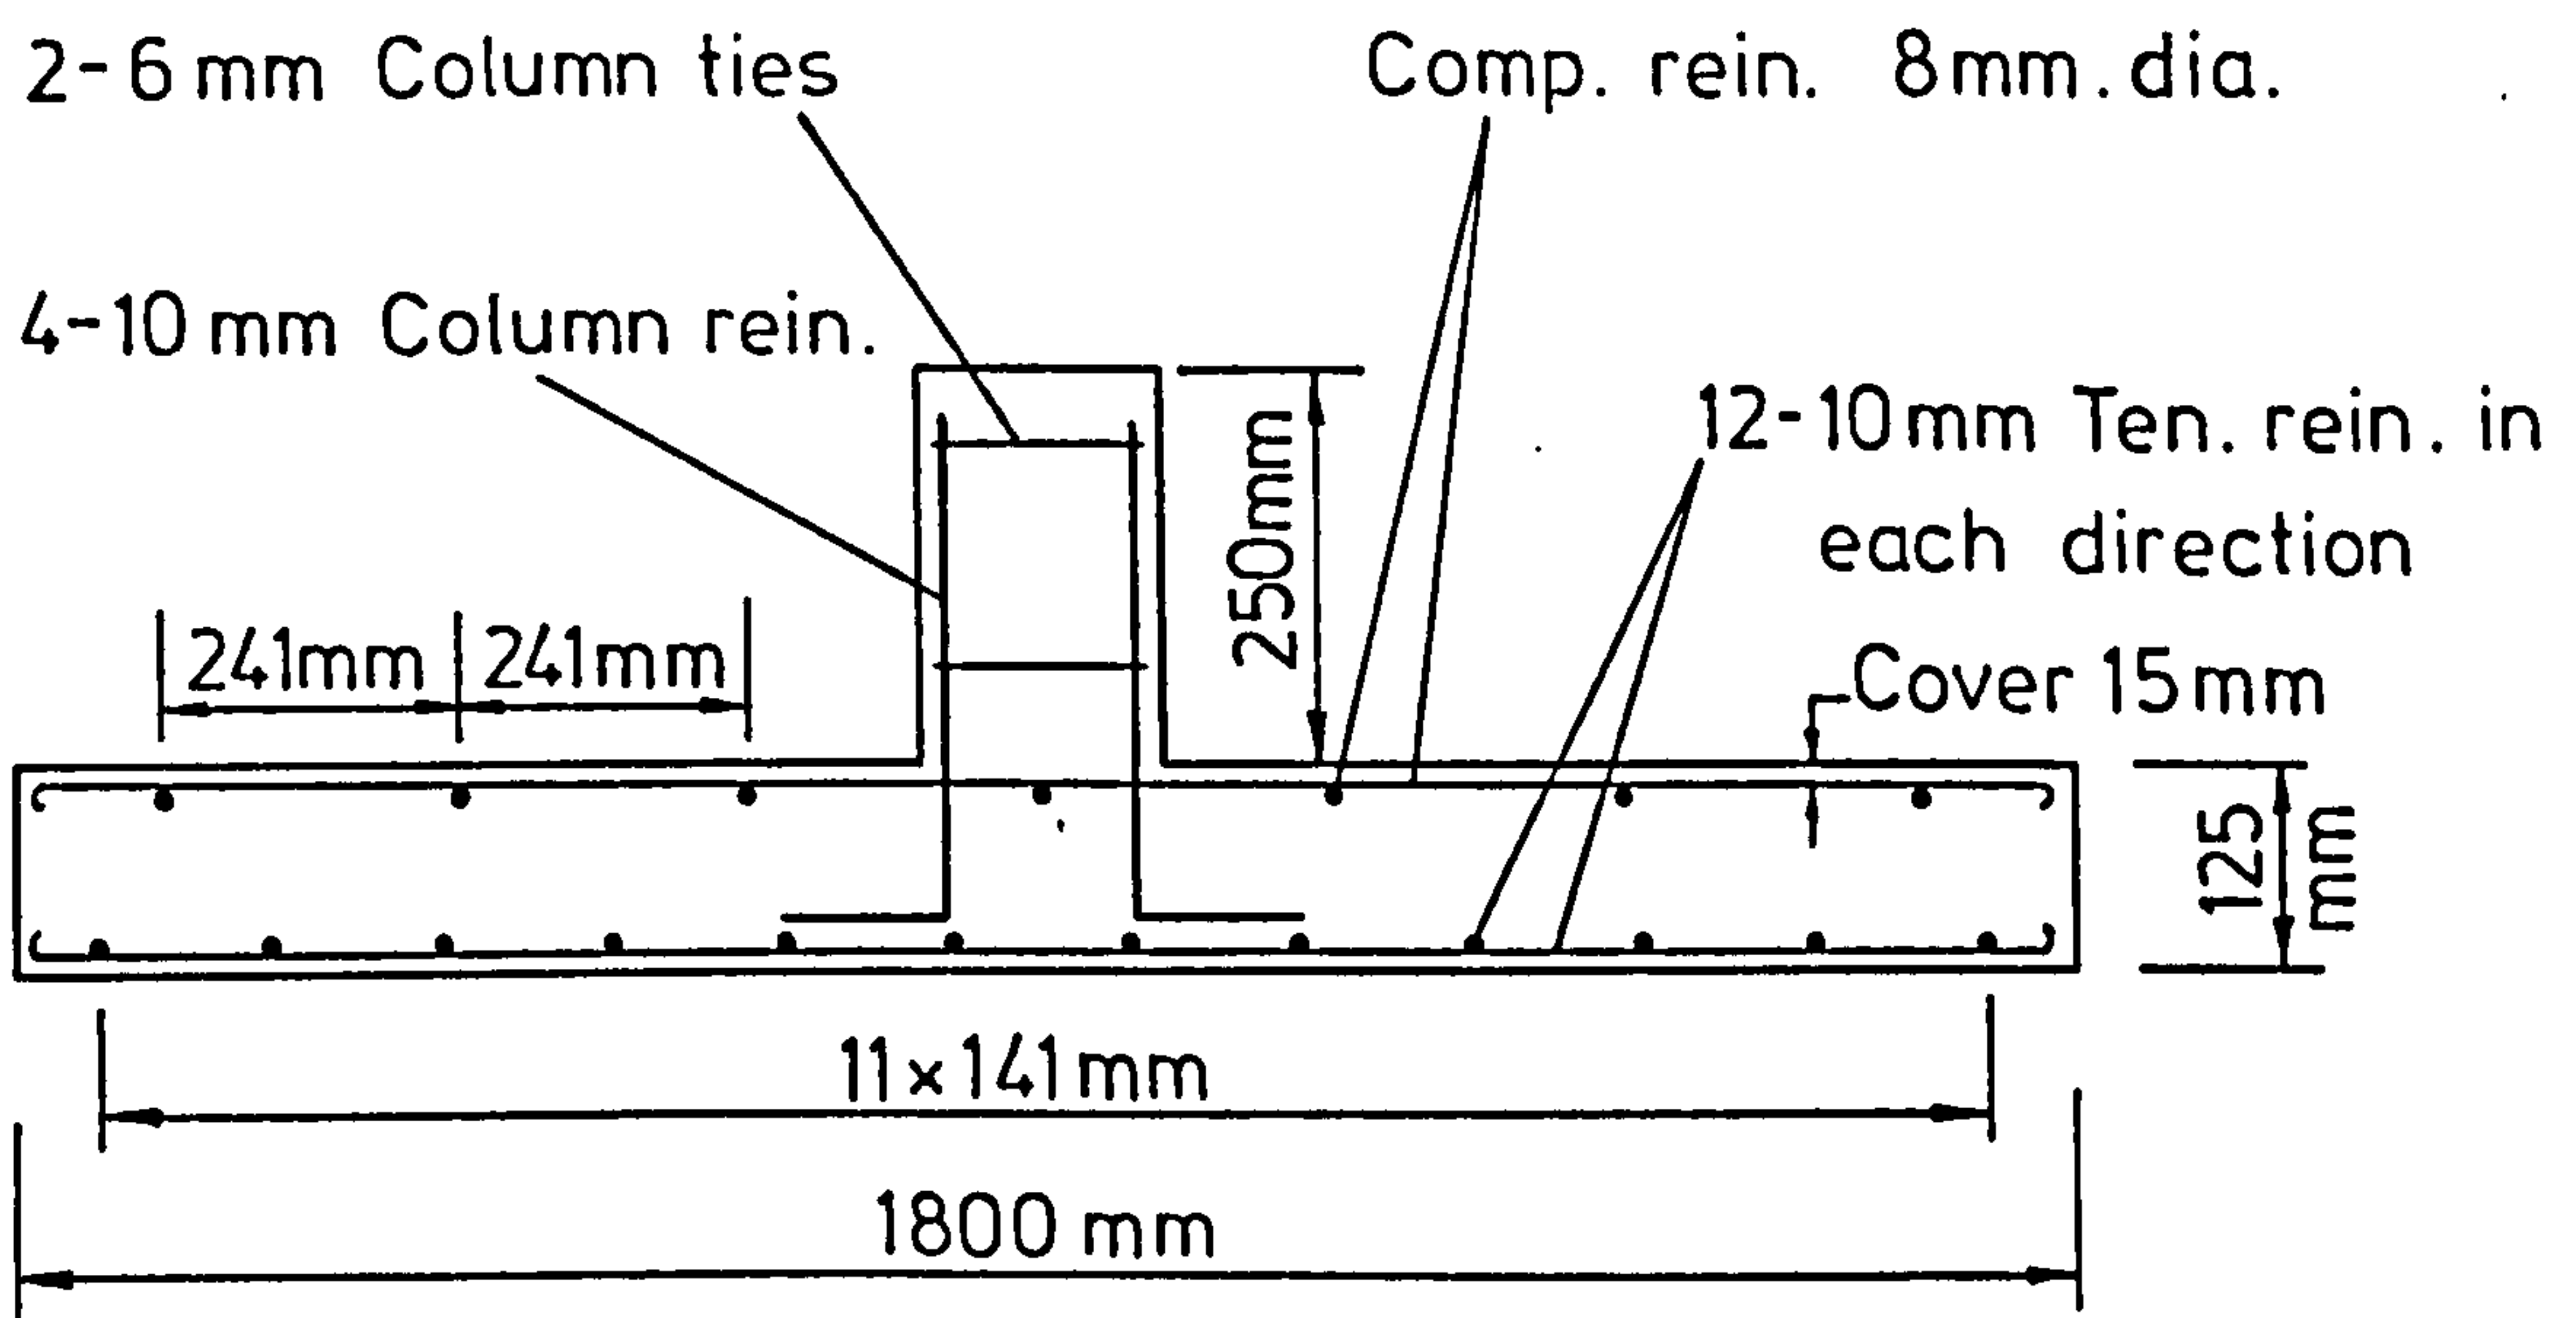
TYPICAL ARRANGEMENT OF STEEL BARS IN SLABS WITH 12-10mm TEN. REIN.
